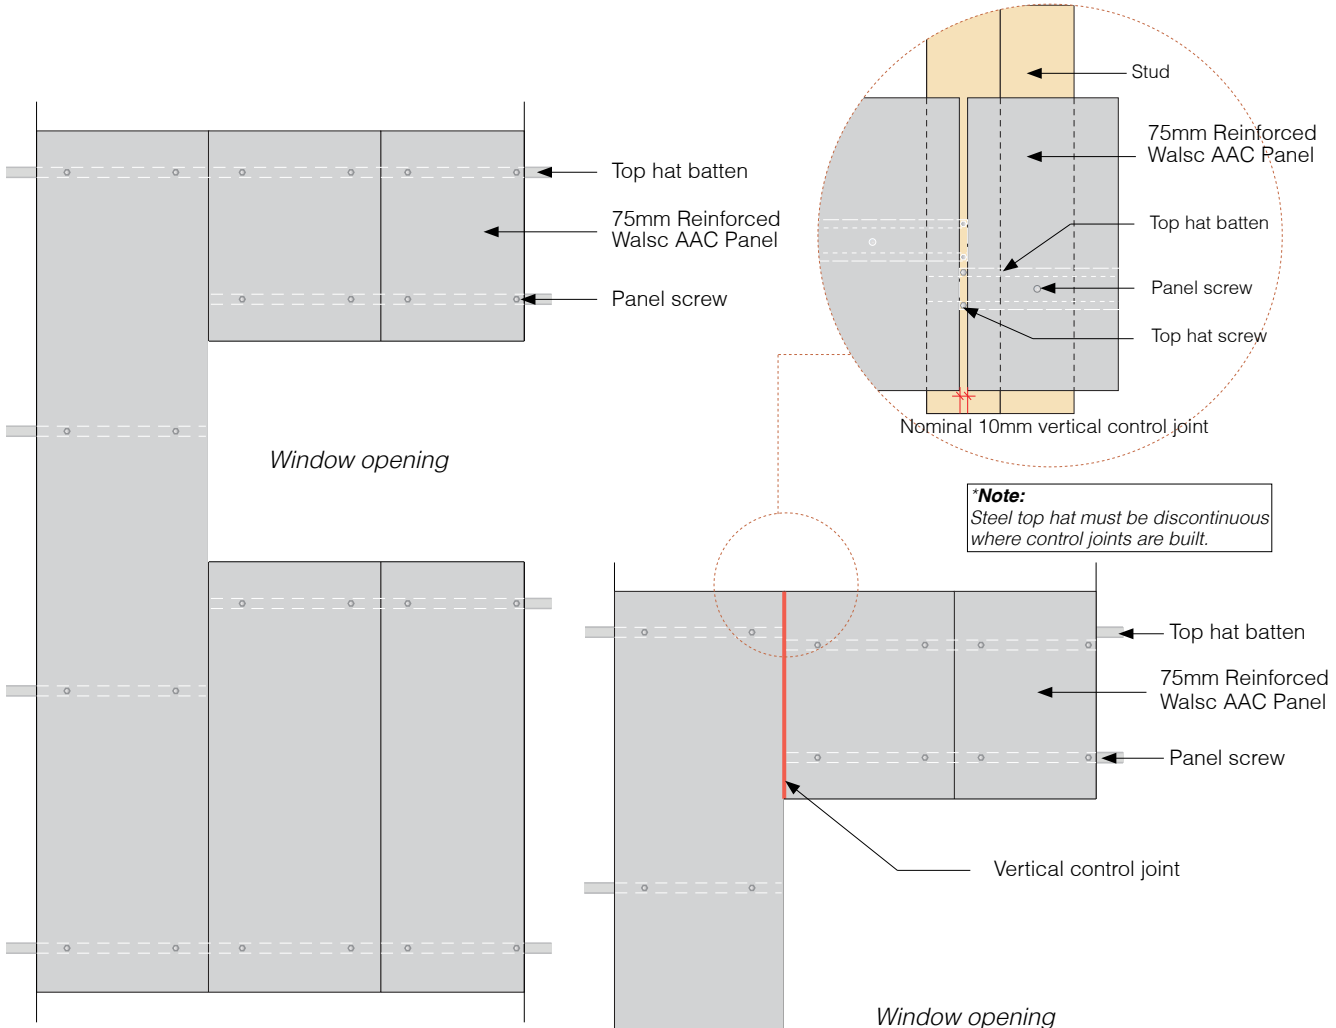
Vertical Aligned System - Typical Opening without Control Joint Detail
